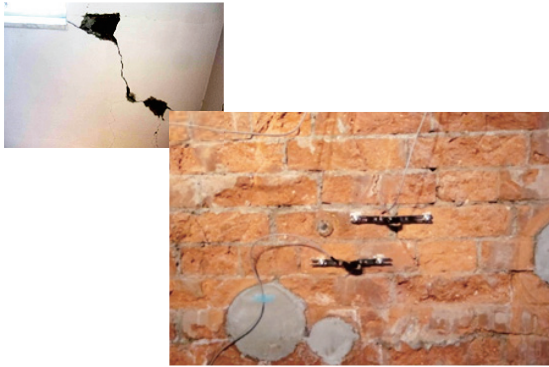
Monitoring the crack displacements in the brick walls.
